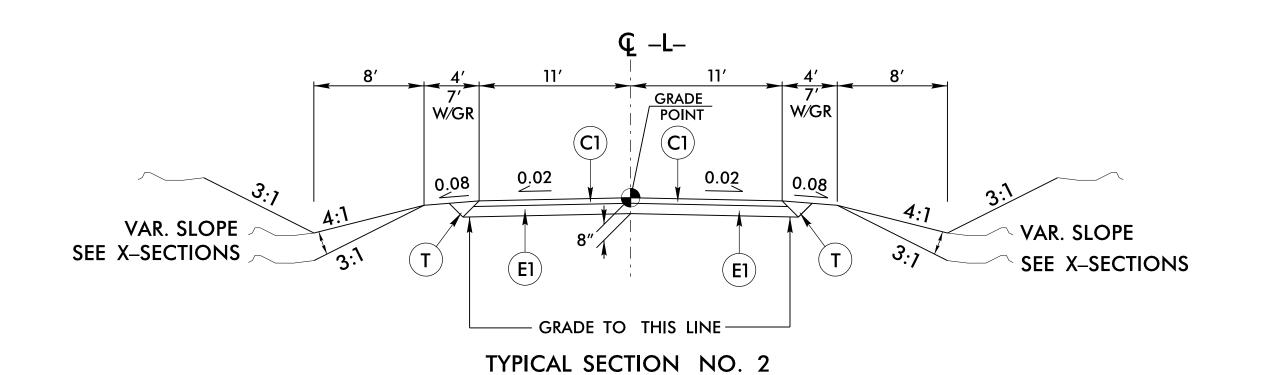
DETAIL SHOWING FULL DEPTH PAVED SHOULDERS TO FACE OF GUARDRAIL
